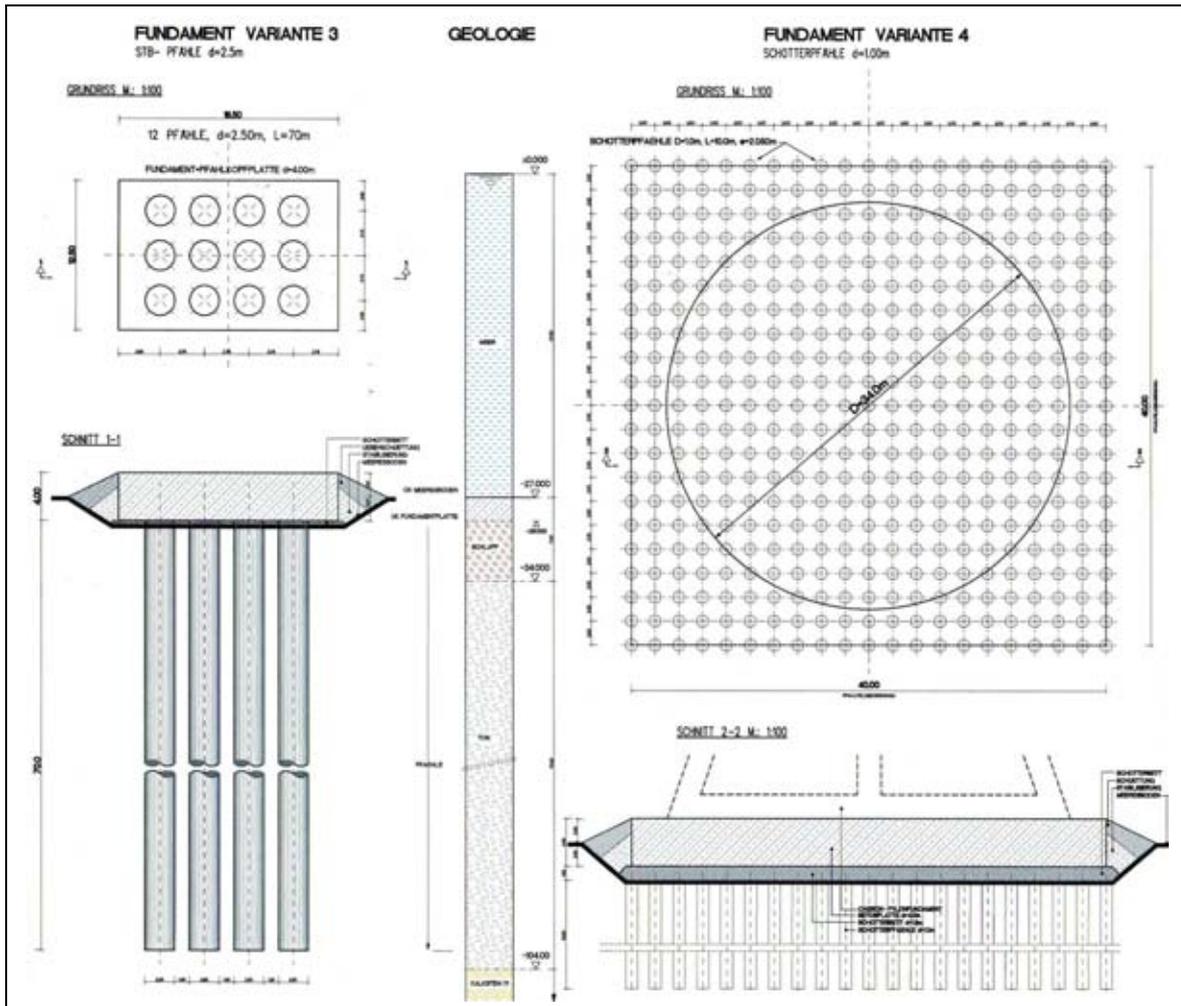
Two investigated foundation options : reinforced concrete 70.0 m deep bored piles (left) and soil improvement with stone columns (right).
